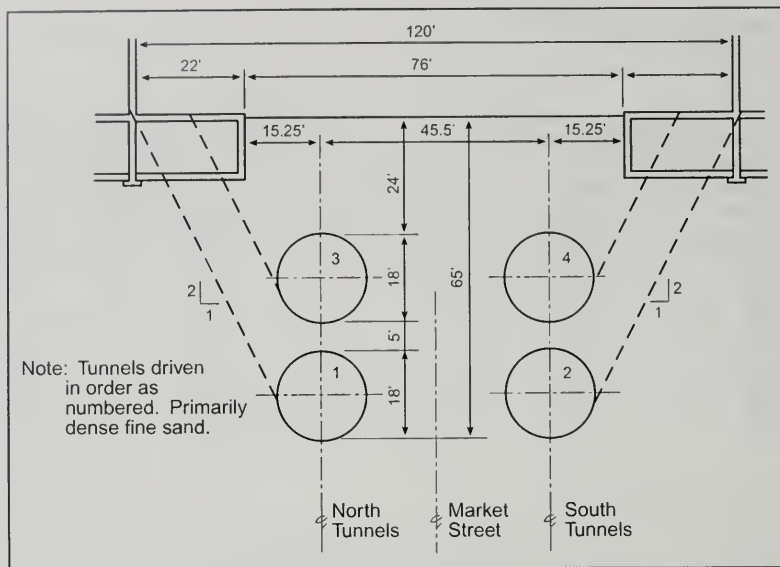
Spatial relationships between the twin MUNI and BART tunnels that ran two miles beneath lower Market Street, between The Embarcadero and Van Ness. Note proximity of the bores to the sidewalk basements, lining either side of Market Street.
